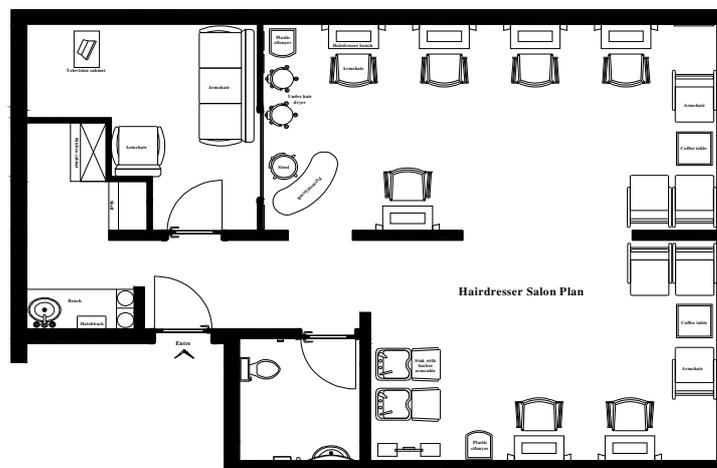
Architectural plan and furnishing elements of the EMA hairdressing salon where the study was conducted.
